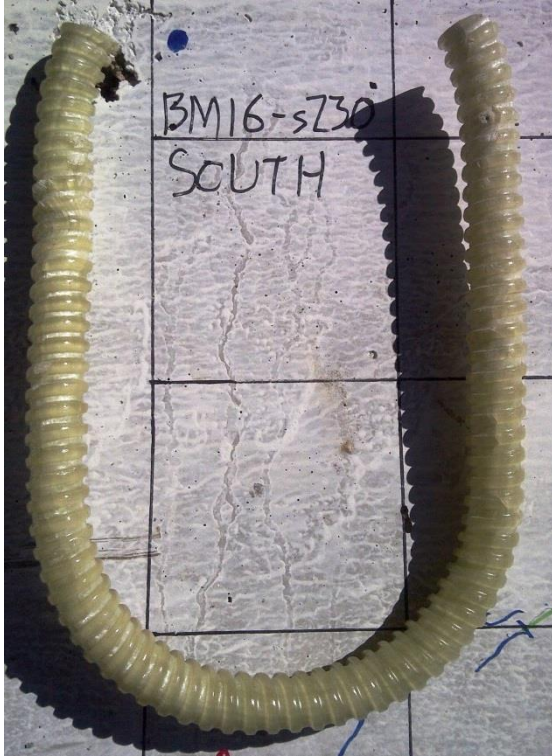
BM16-s230 Photo of Exposed Stirrup 9 and Longitudinal Bars
